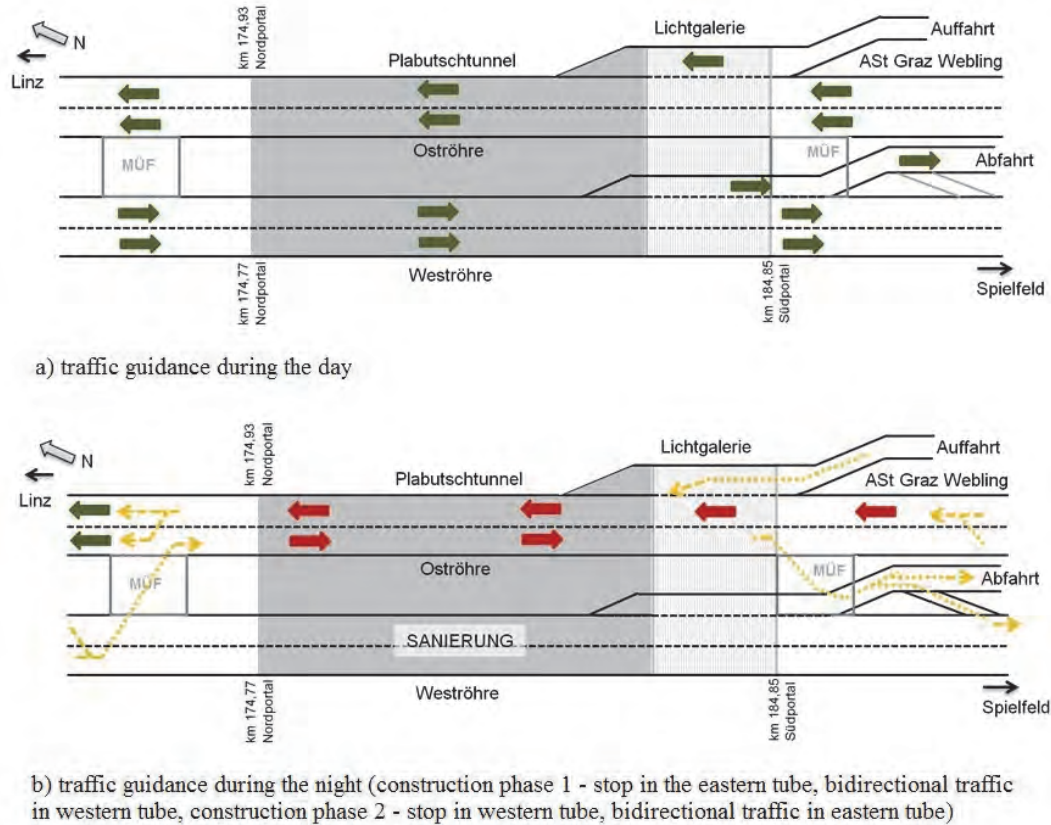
Traffic guidance Plabutsch-Tunnel (Reinwald M. 2018)
